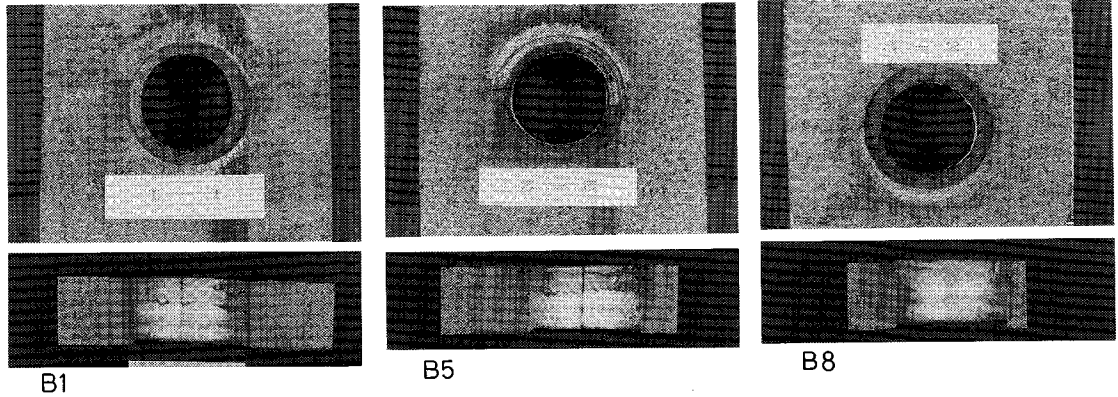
Main plates surface after fatigue test and fatigue cracks propagated from the wall of hole.
